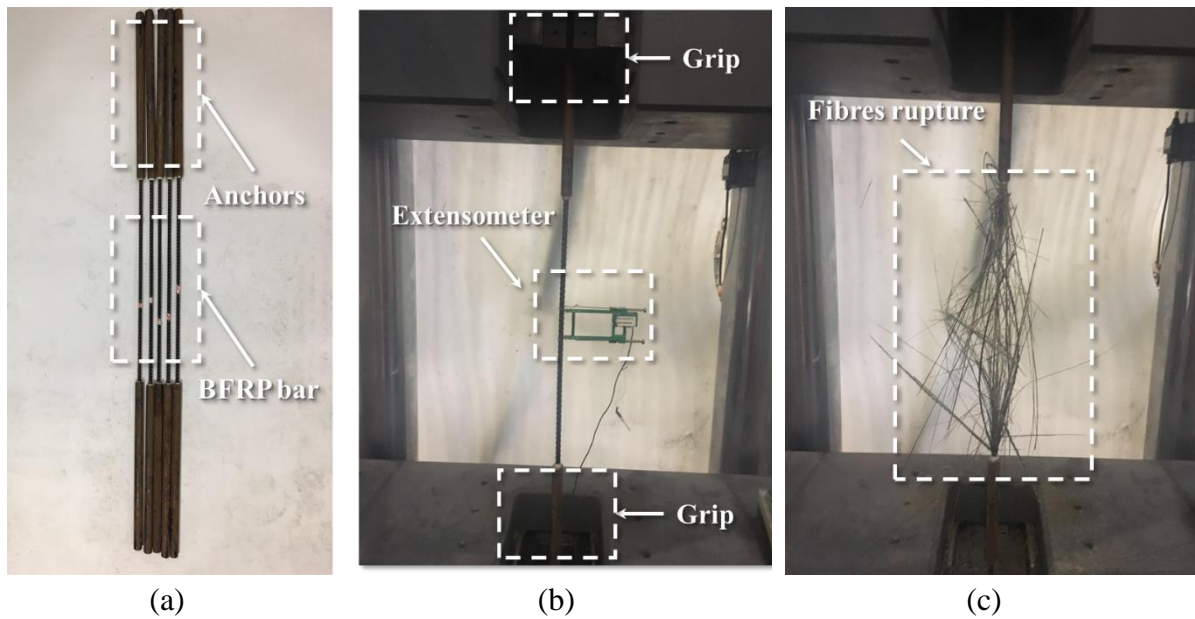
Tensile test of BFRP bars: (a) BFRP bar specimens and steel anchors; (b) tensile test setup; (c) BFRP bar after failure.
